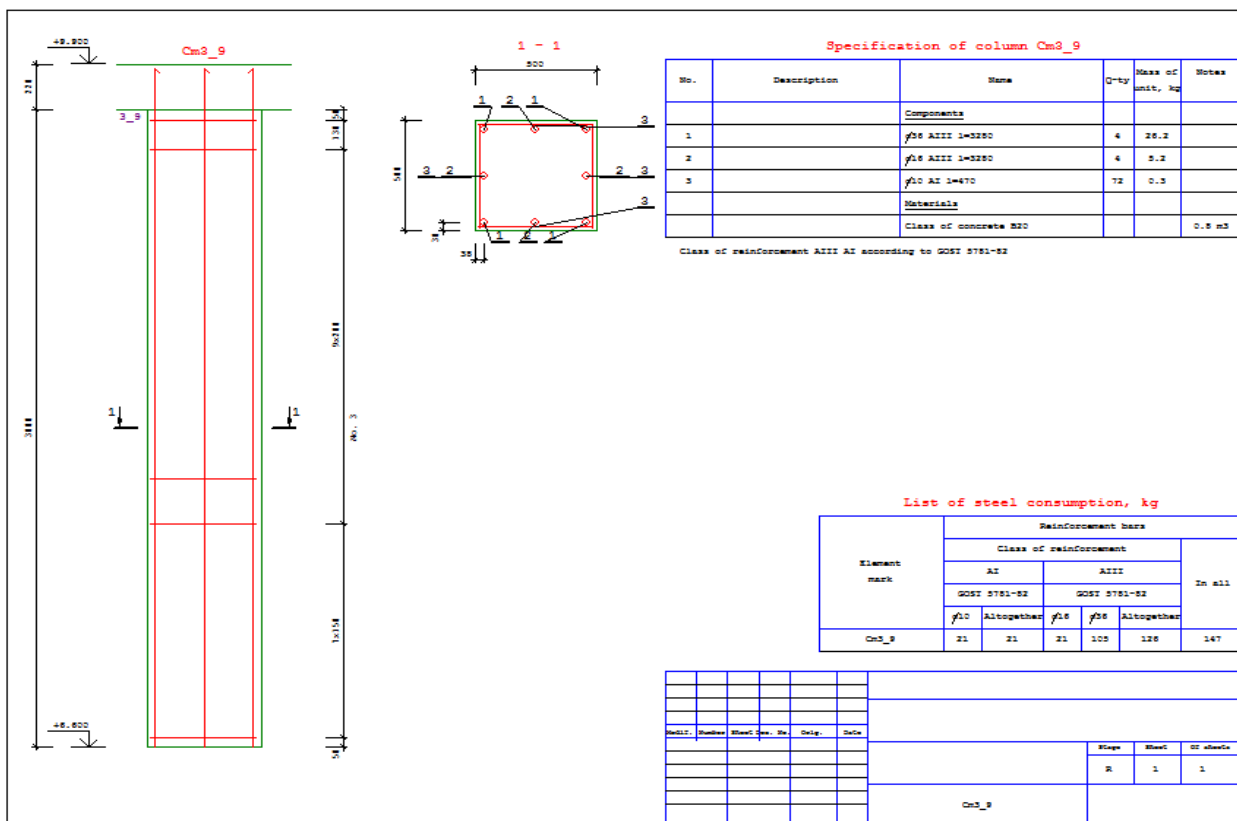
Variant of a building with slab floors. Column K3-9. Working project drawings
